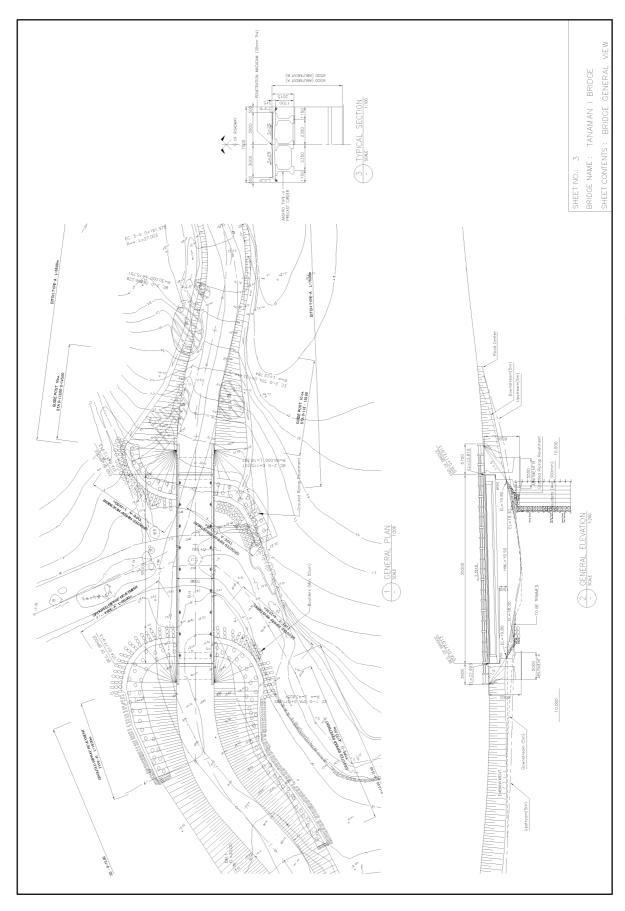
Bridge General View of Tanaman I Bridge
